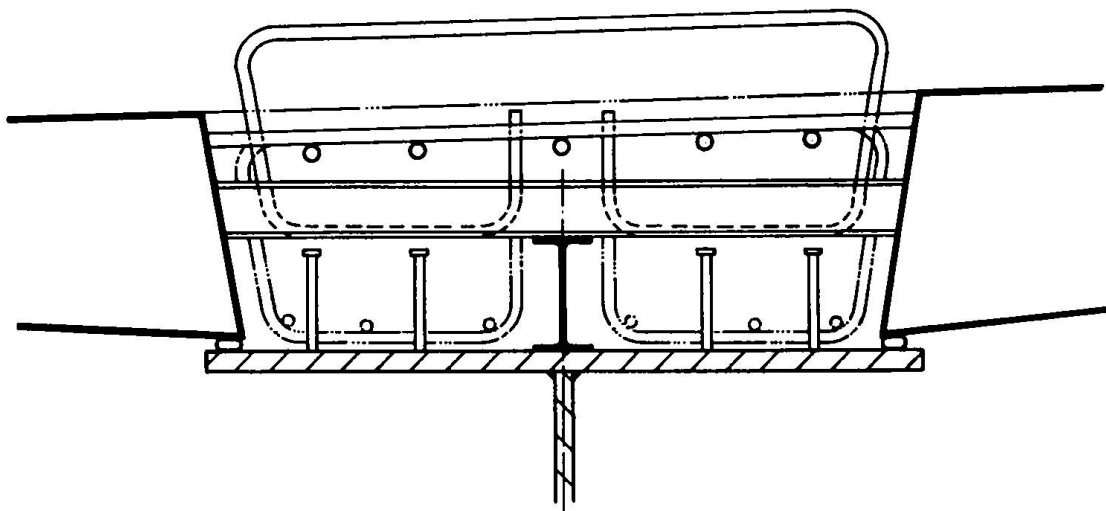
In this solution, independent elements of the precast slab, connected by steel beams, are supported by vertical plates.
